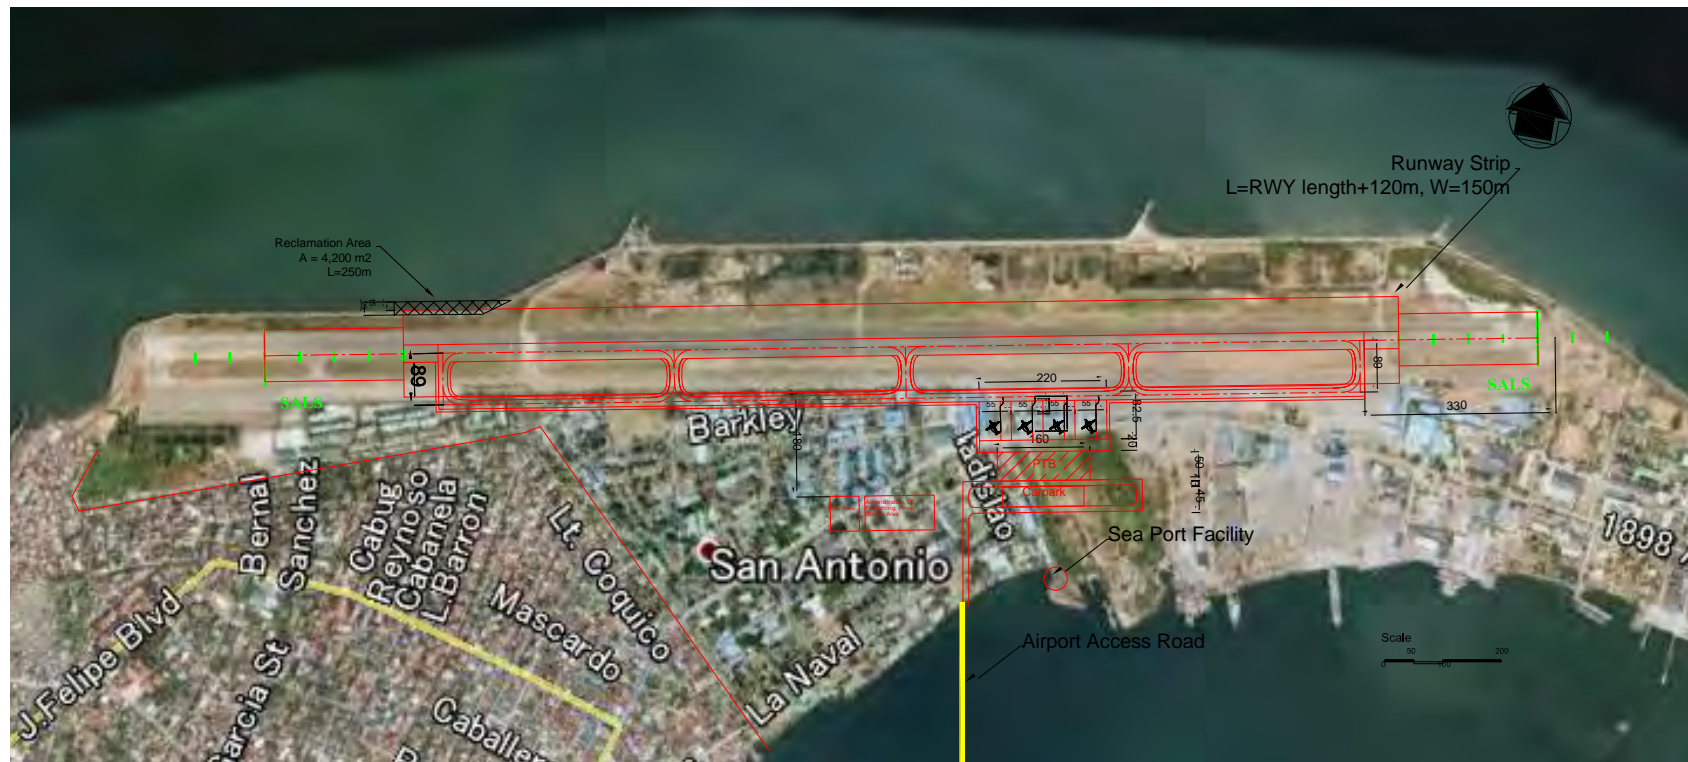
Improvement Layout Plan Case-1
